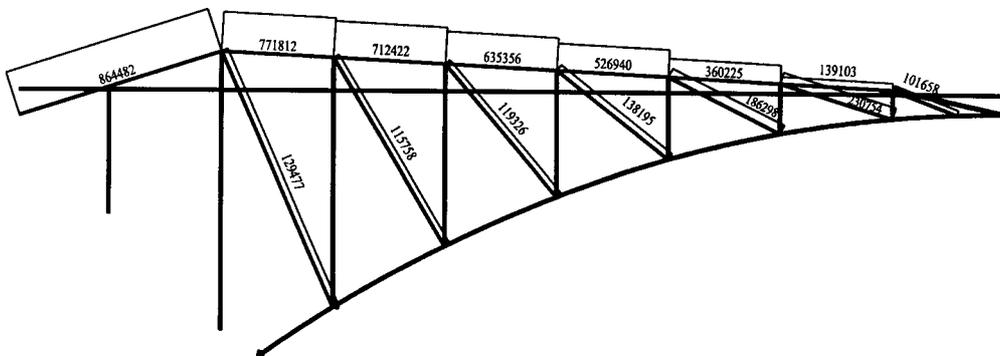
Diagram of longitudinal forces in tie rods at concreting the last segment of the arch in case the complete arch section is executed
